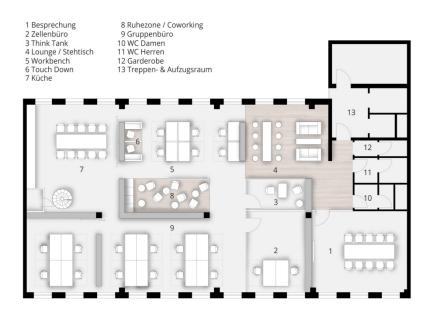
Canzler floor plan: Sample floor plan for a multi-space office in a very small space. Centrally arranged are lounge, rest and coworking zones as well as a think-desk-sharing workstation. Group, cellular and meeting rooms are grouped around the outside.
